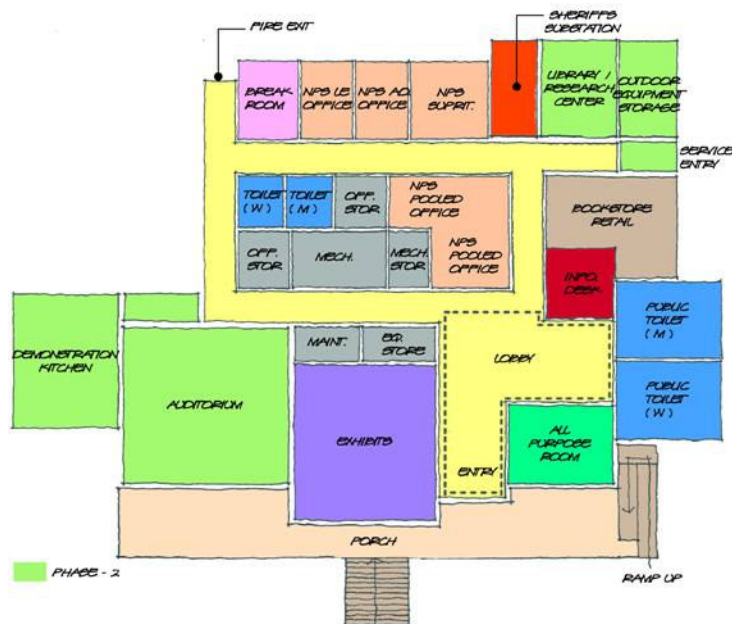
ALTERNATIVE C, DERRY SITE PLAN
